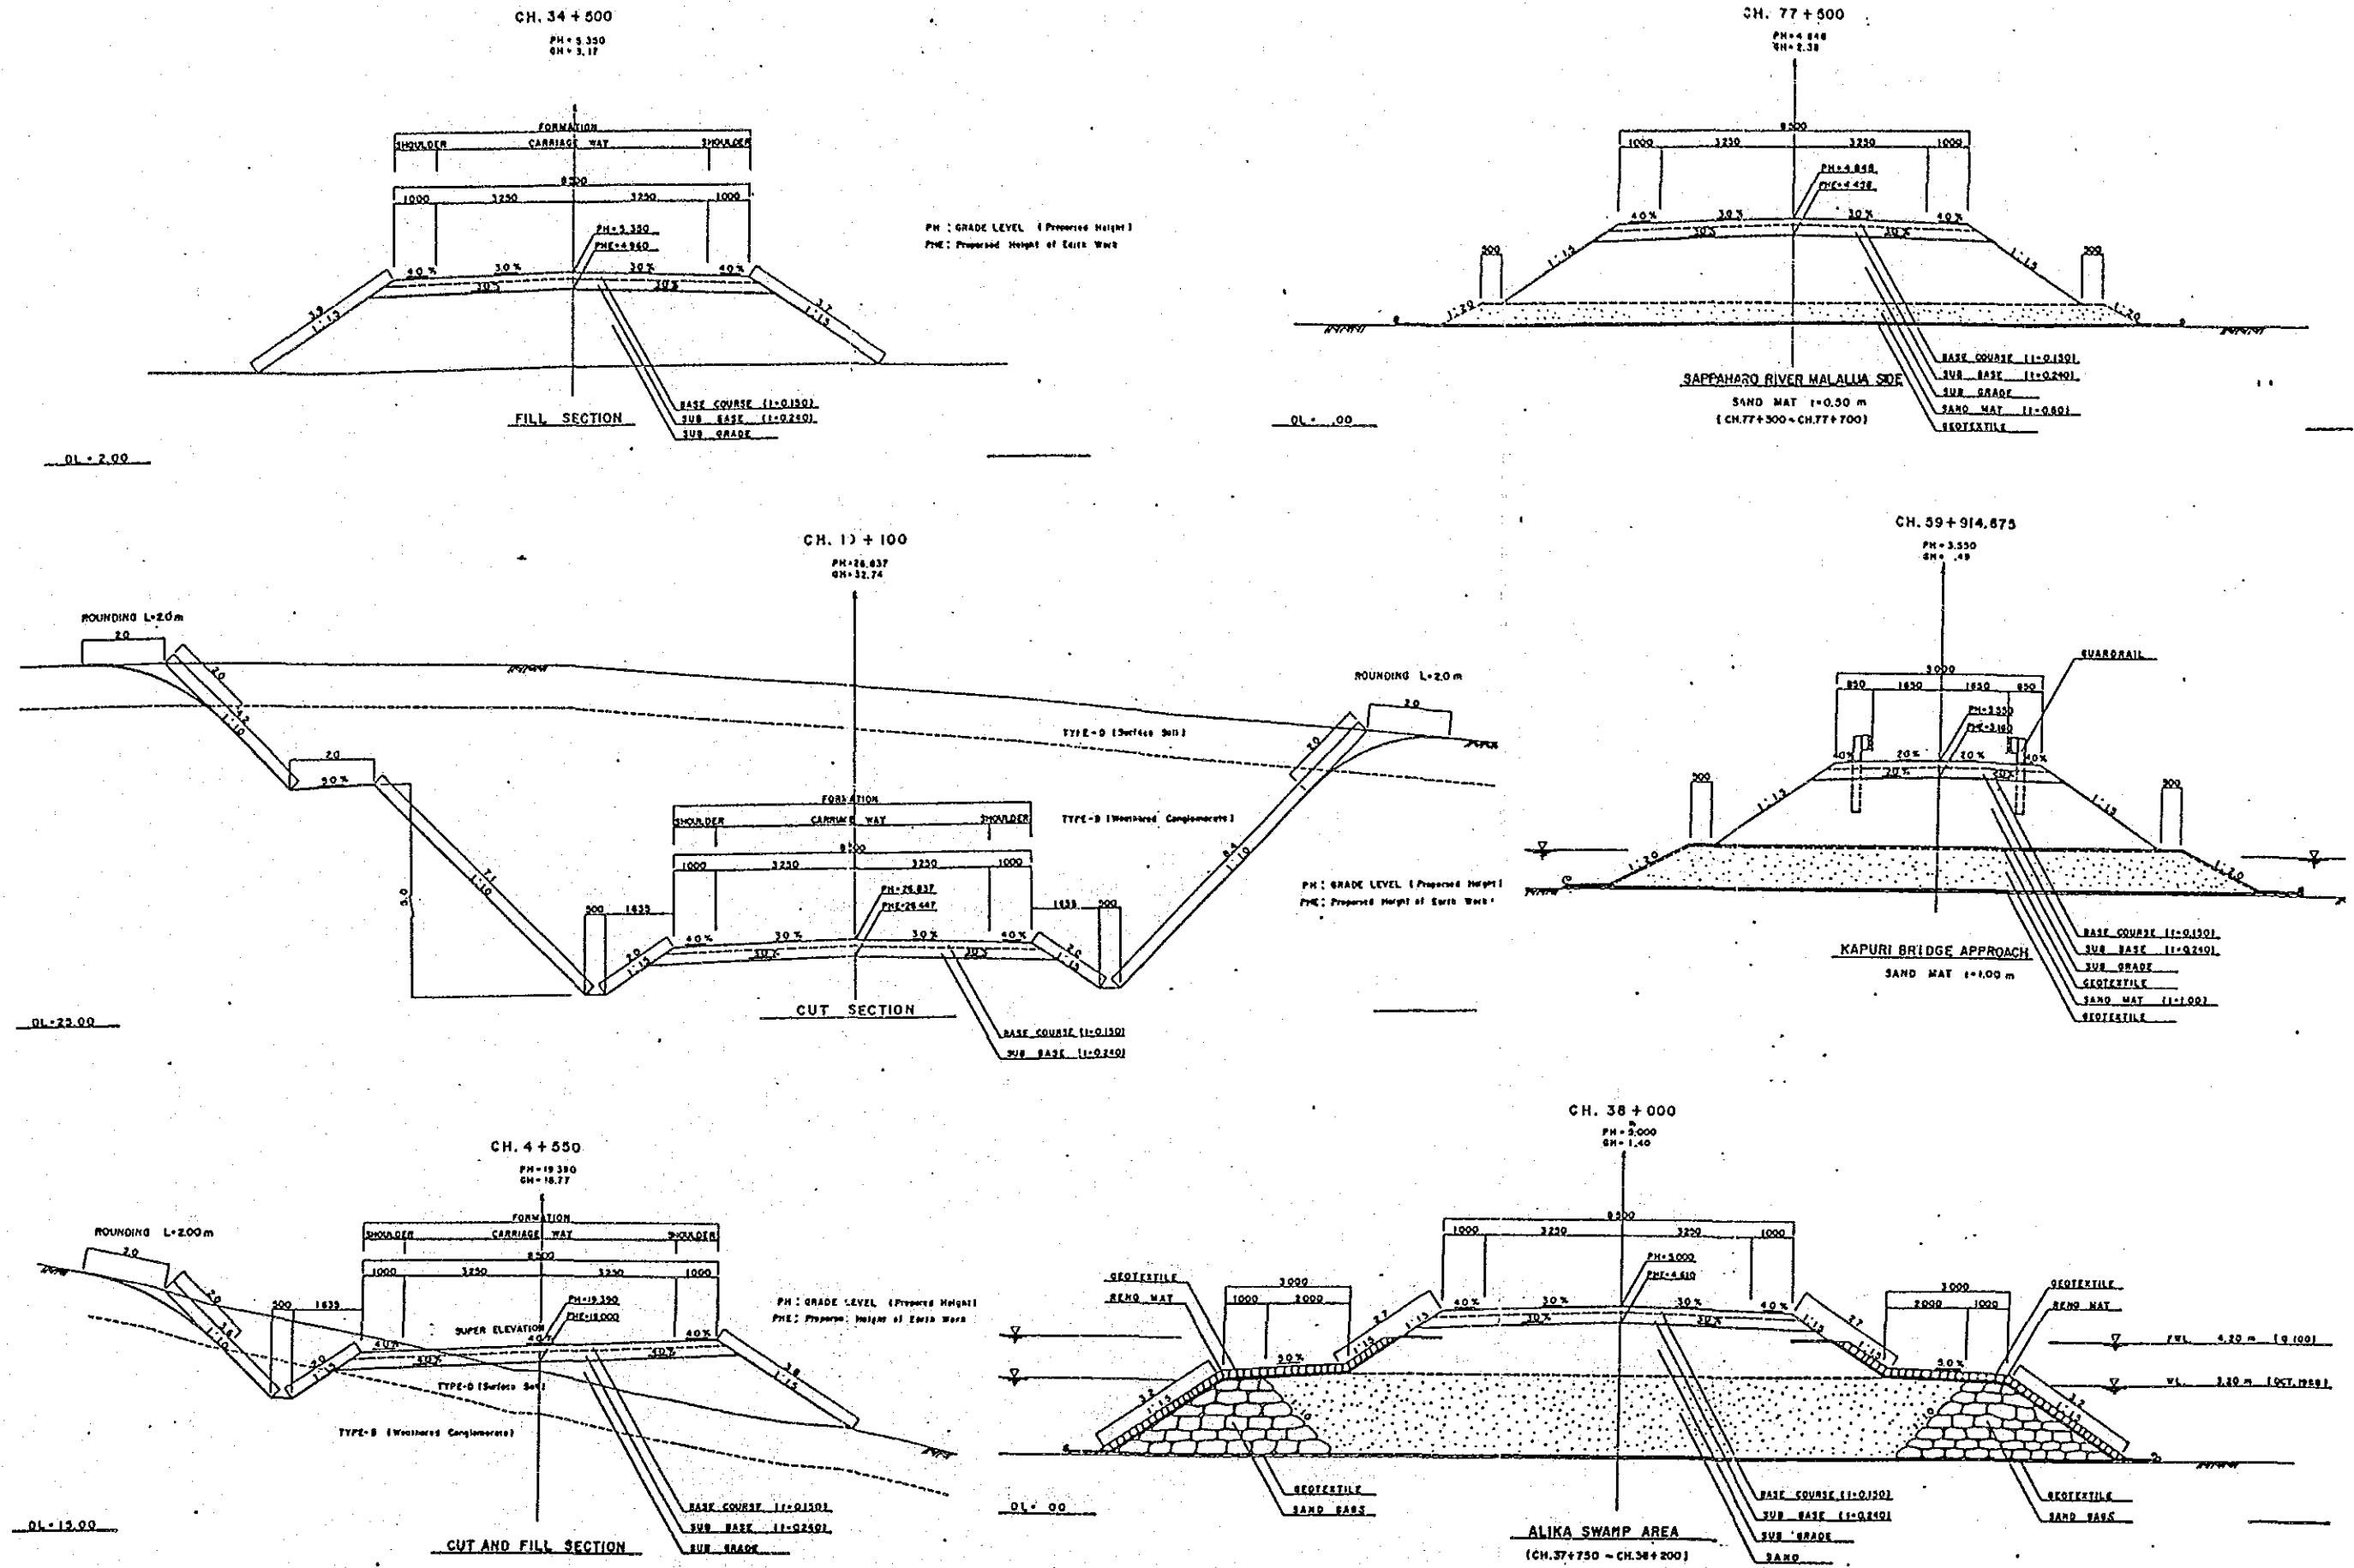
TYPICAL CROSS SECTIONS OF CUT & FILL AND SOFT GROUND
